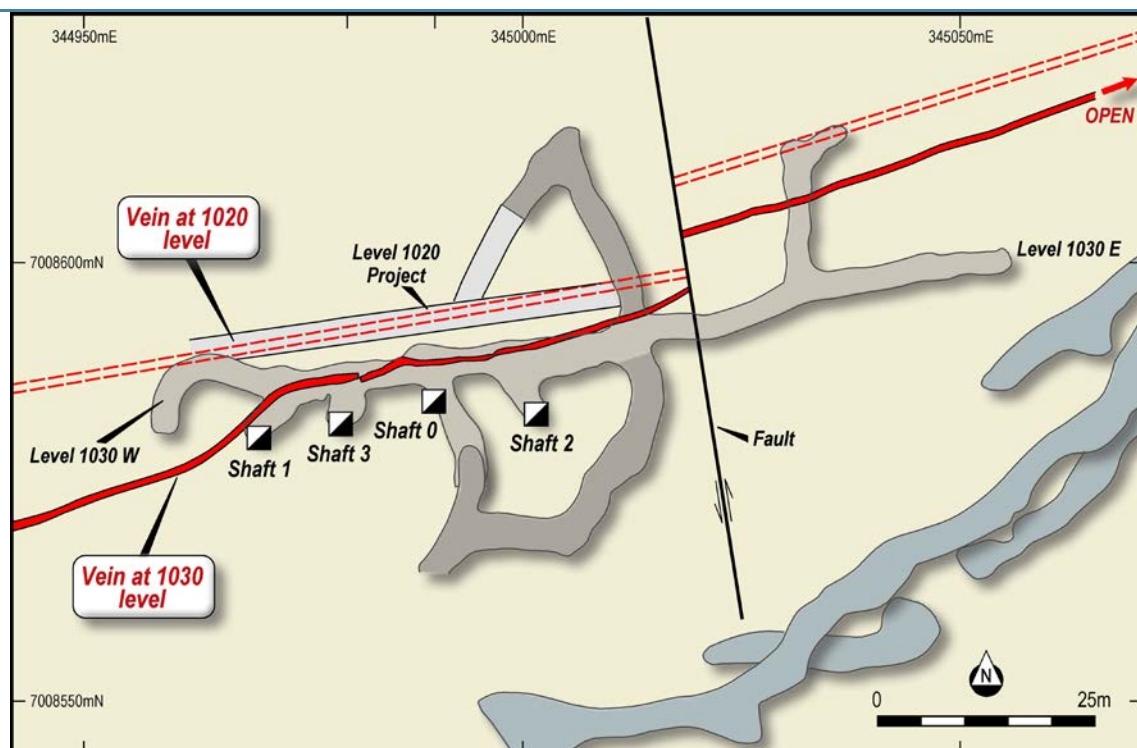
Plan view of San Sebastian showing location of production shafts and waste development of the stope bypass tunnel, 1020 level ramp and crosscut 2.
